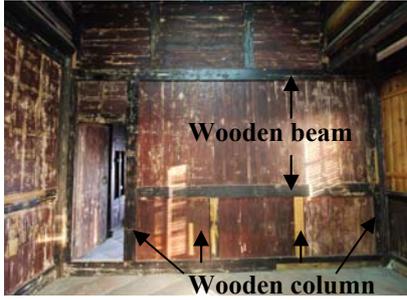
The wooden panel wall in Taiwan's traditional wood building
